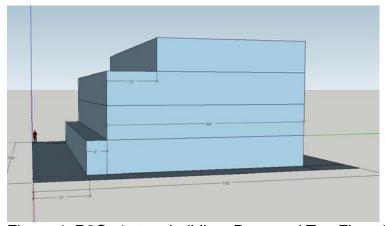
R3C- 4 story building: Proposed Top Floor 15 foot stepback
